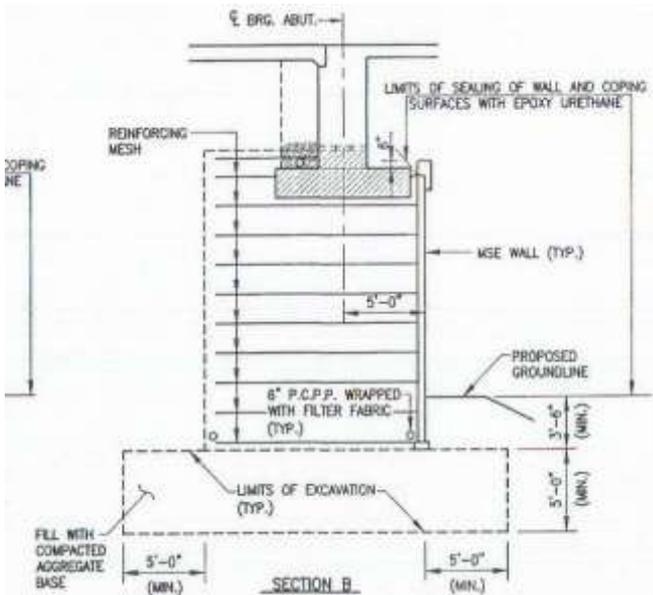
C Typical Plan Cross Section of a MSE Wall
